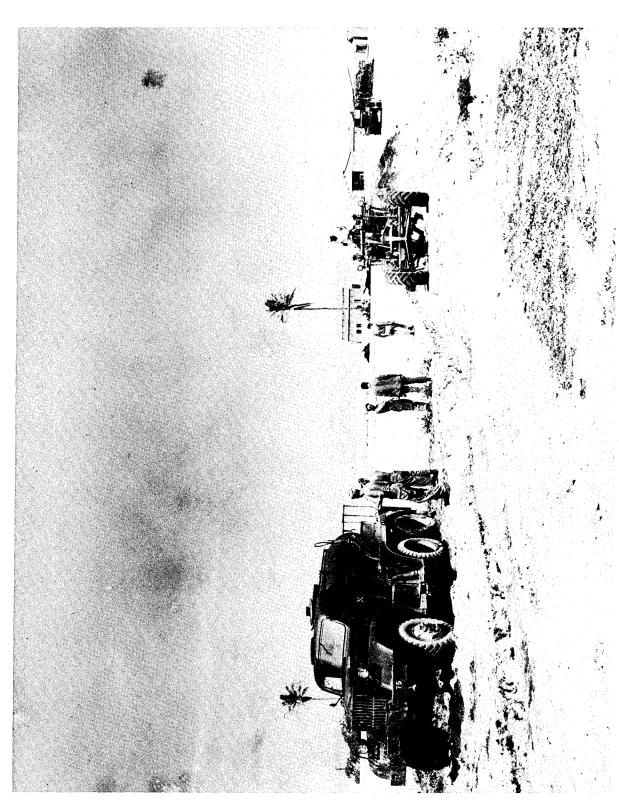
Back Filling Cable Trench With Engineer Grader
